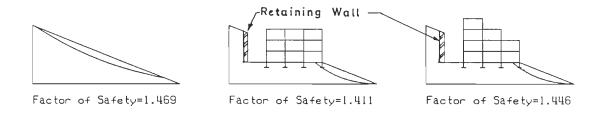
Sliding Failure Surface of Slope Under Static Loads
